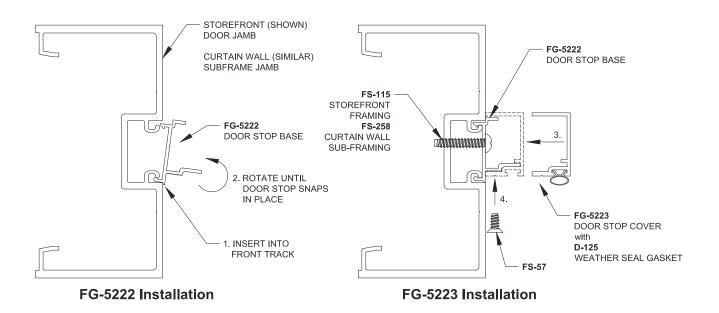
Attaching Two-Piece Door Stop to Door Jamb
